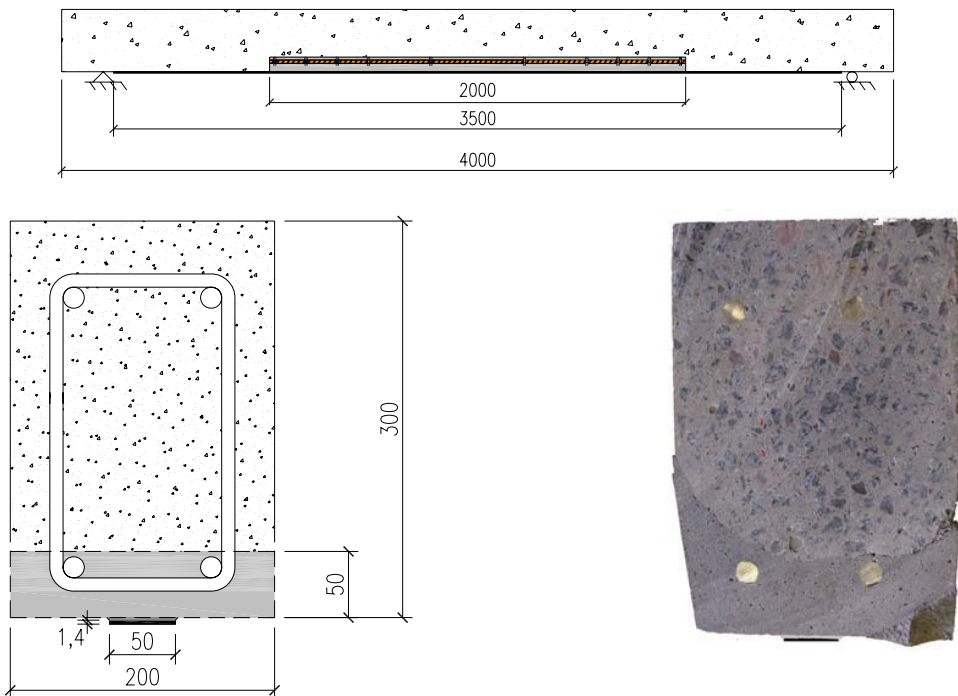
Top: Beam specimen measurements and steel reinforcement layout. Bottom left: Cross sectional view of intact beam. Bottom right: Cross section of real intact beam.
